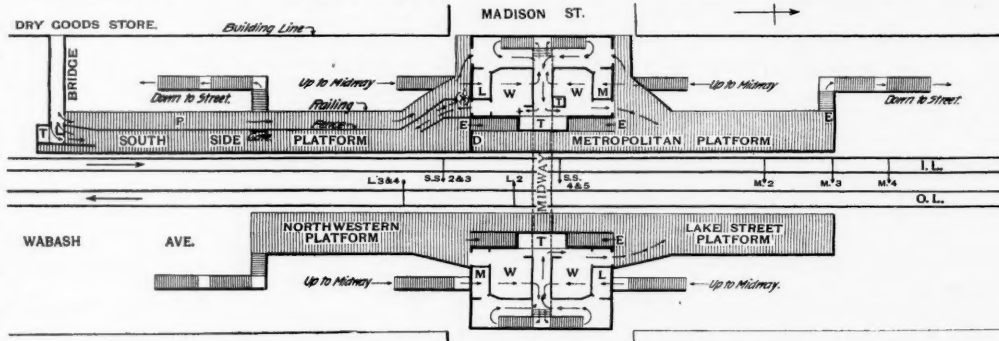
Wabash Avenue and Madison Street Station, Union Elevated Railroad, Chicago.
